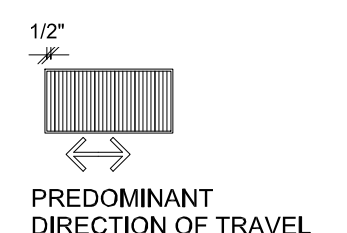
OPENINGS IN FLOOR OR GROUND SURFACES
